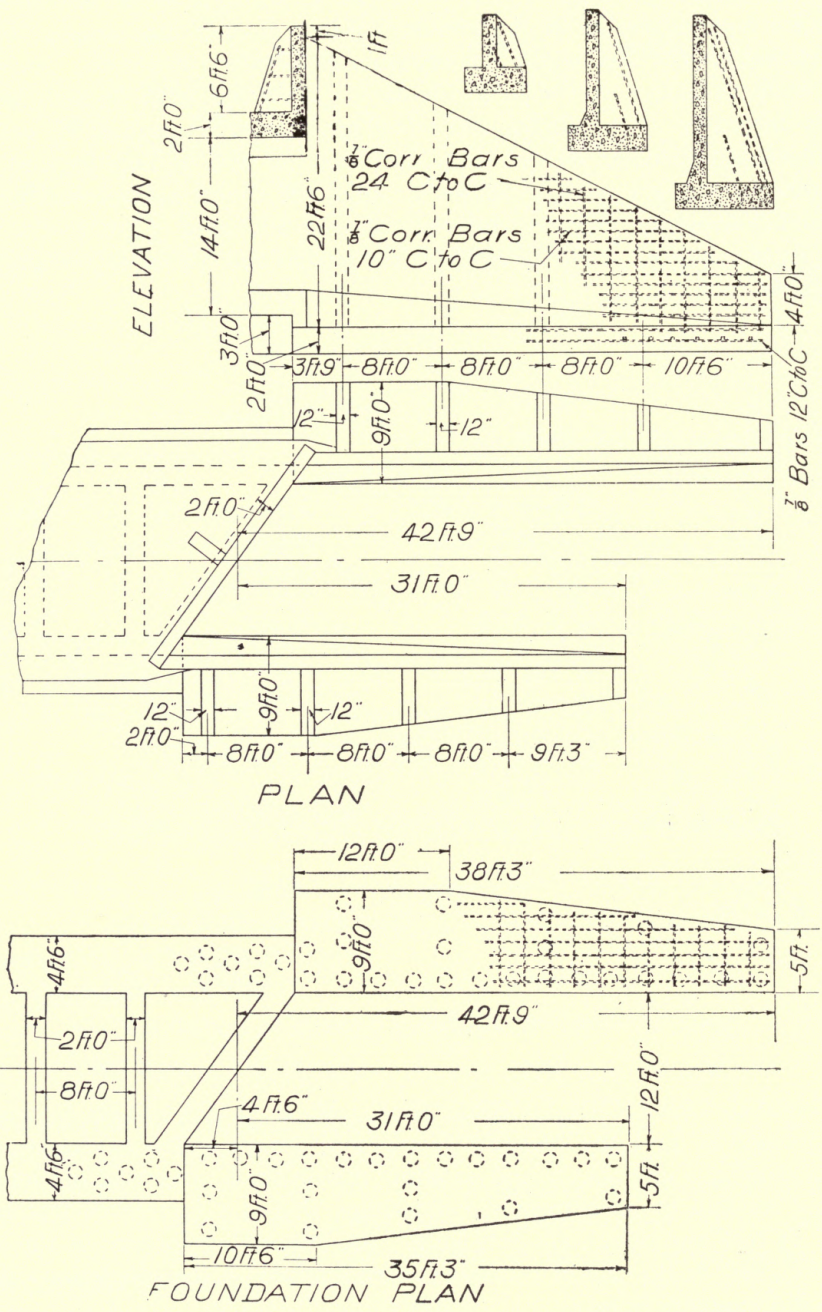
PLAN AND ELEVATION, INDIAN CREEK CULVERT.
